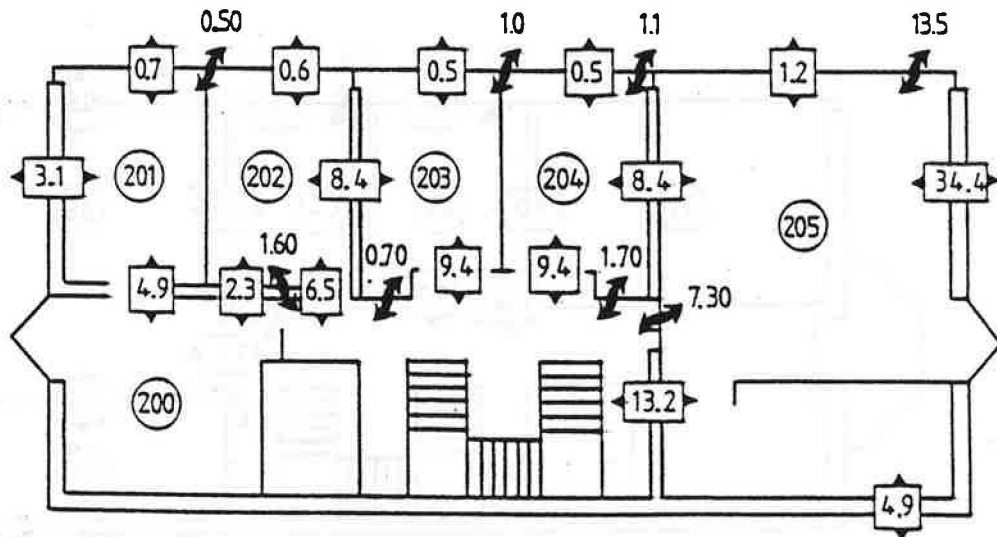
Thermal conductances in [W/K] between rooms and also with outside. Third floor.
